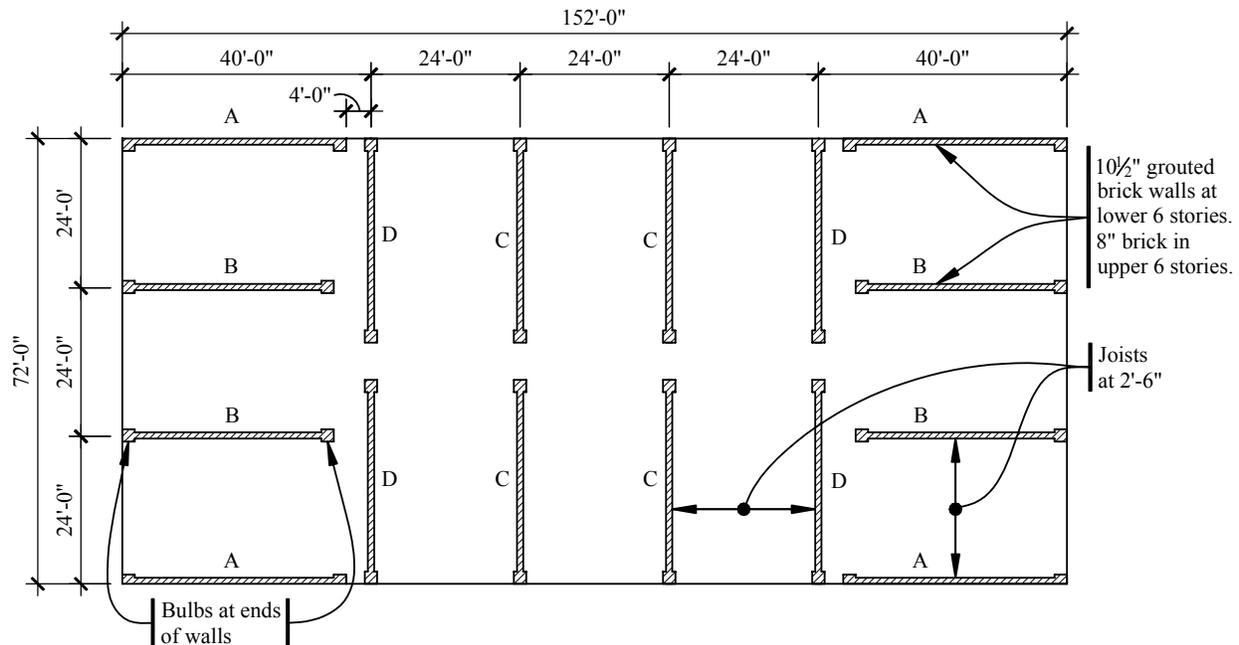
Floor plan (1.0 ft = 0.3048 m, 1.0 in. = 25.4 mm)
